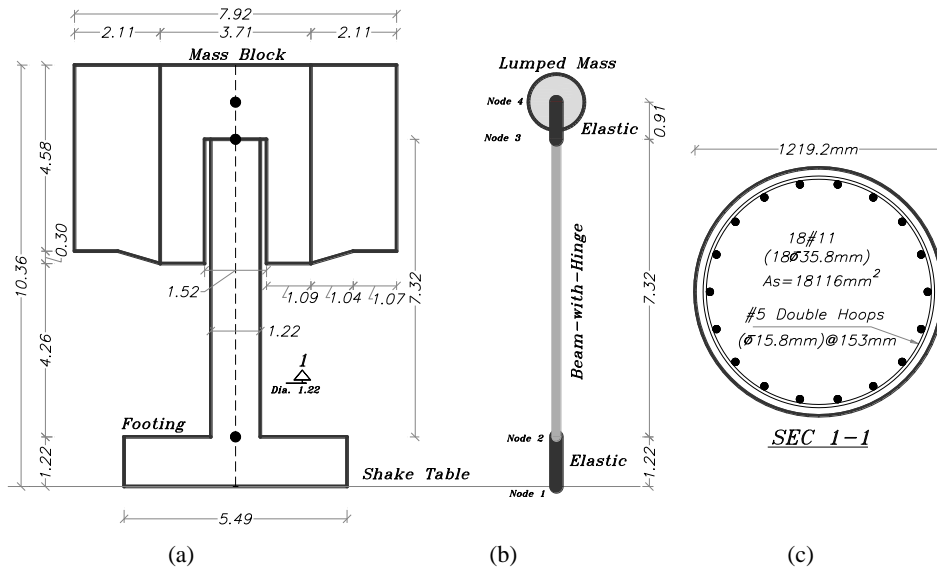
(a) Geometry of full-scale UCSD Column (unit: m), (b) 4-node Model, and (c) Column Section (unit: mm); 1 in.=25.4 mm
